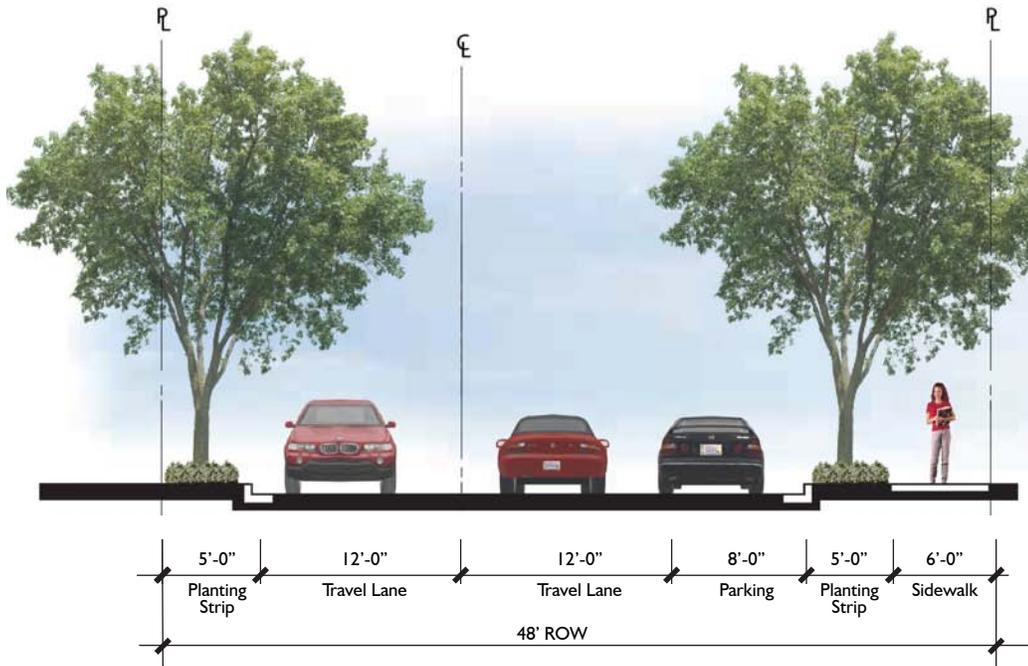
Internal Local Street for 8-11 Residential Units per Acre. Parking on one side. (Minimum Allowable)
